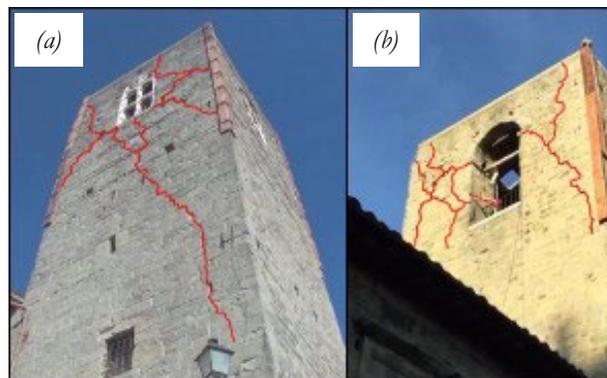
Real damage of the North façade (a) and West façade (b).
